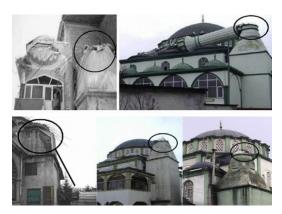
Failures or damaged RC minarets (Sezen et al. 2008)
